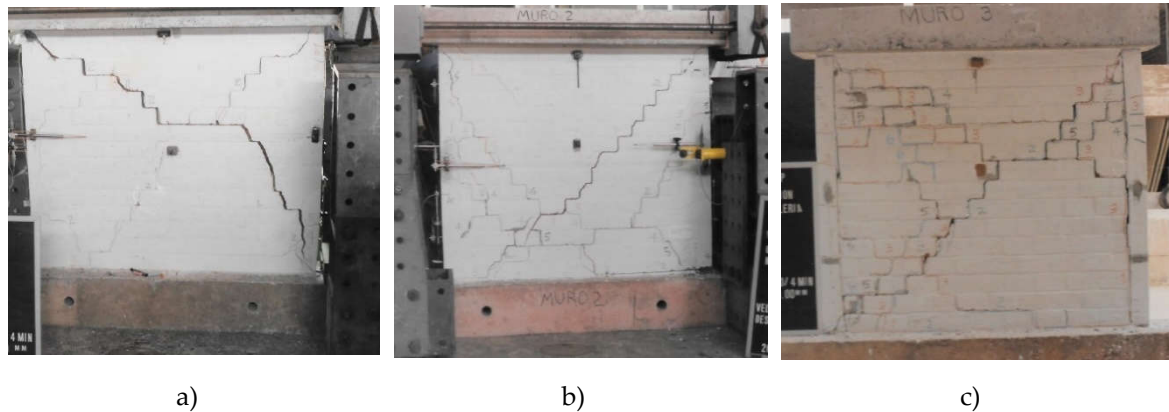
Walls with different interface arrangements: a) Wall 1 (toothed connection); b) Wall 2 (no toothing or dowels) and c) Wall 3 (doweled connection) [122]
